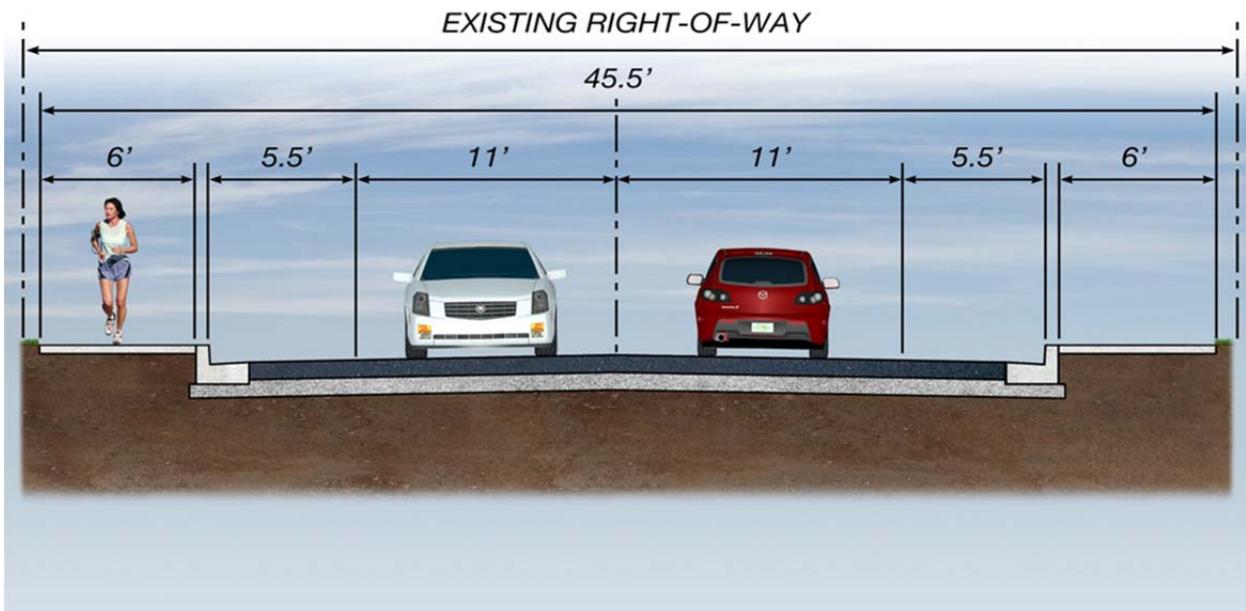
Proposed Roadway Section East of Proposed Movable Bridge
